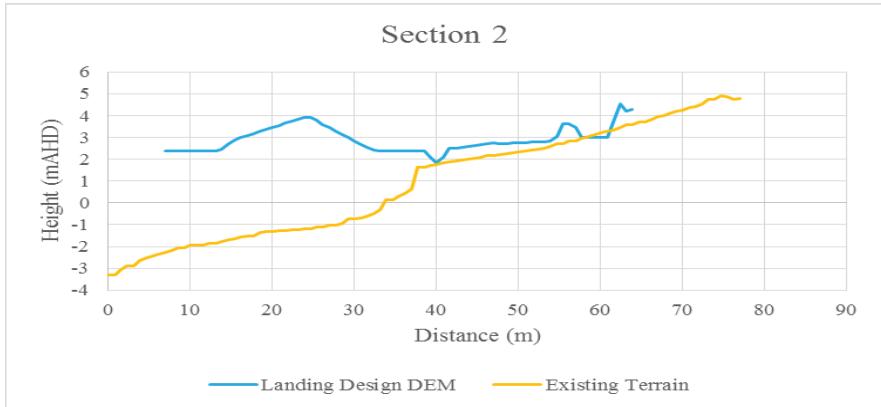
The Landing – Design DEM section 2 view (refer to Figure 67)
